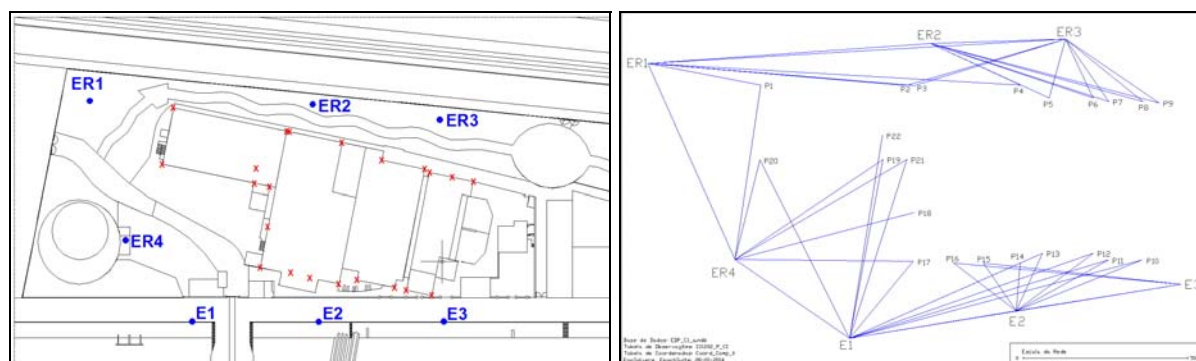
Reference Network plan (left) and horizontal observations (right)
